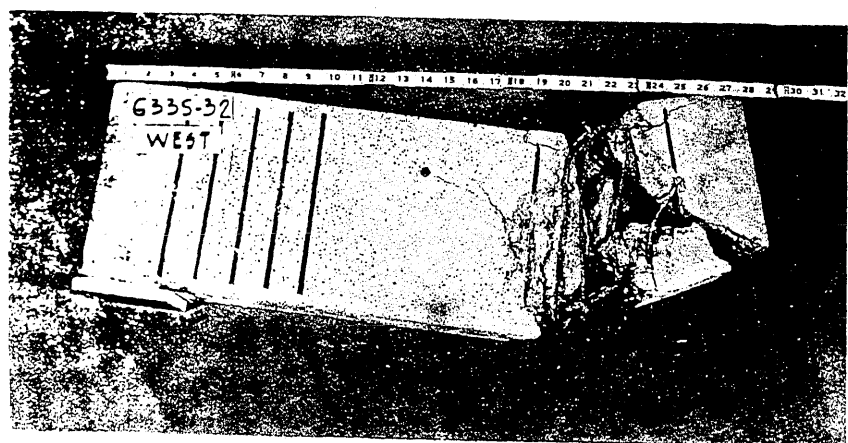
PHOTOGRAPHS OF STATIC TEST FAILURES
